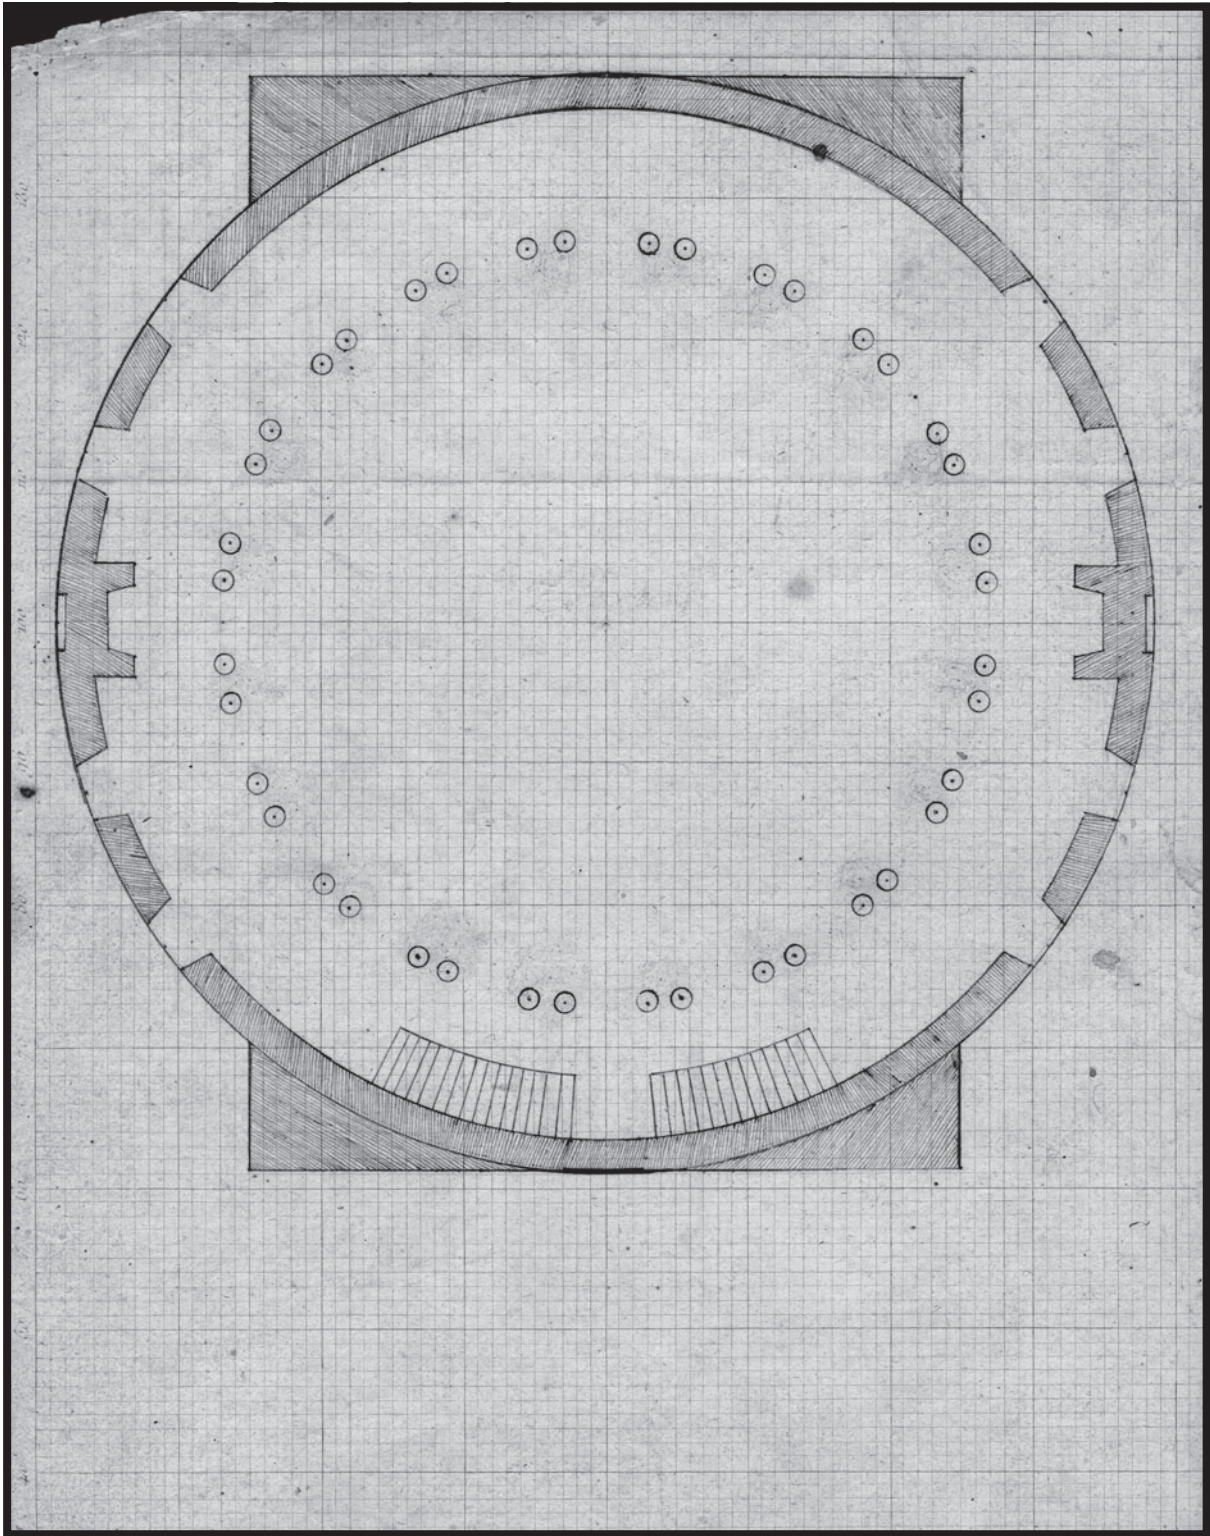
Thomas Jefferson, plan of the Dome Room of the Rotunda, drawing begun 1818, completed by March 29, 1819. Note absence of openings in the north and south walls.
